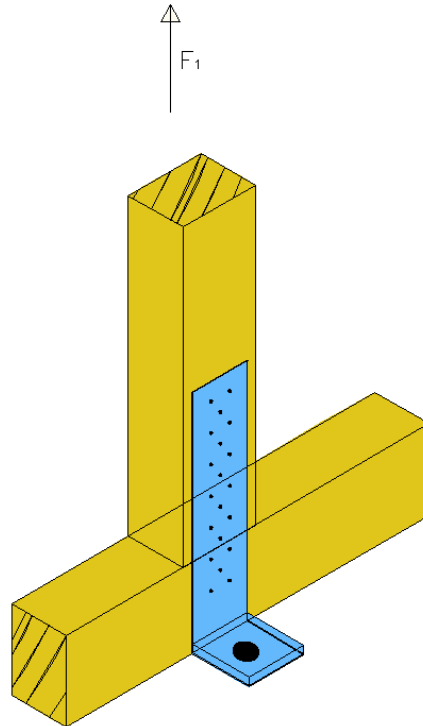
Forces – Column to concrete or steel connection with hold-downs ( $F_1$ )
